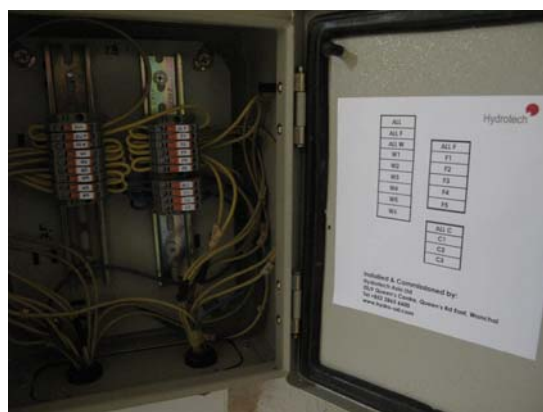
A, MPS Control Unit & junction box installed in Battery Room 2
